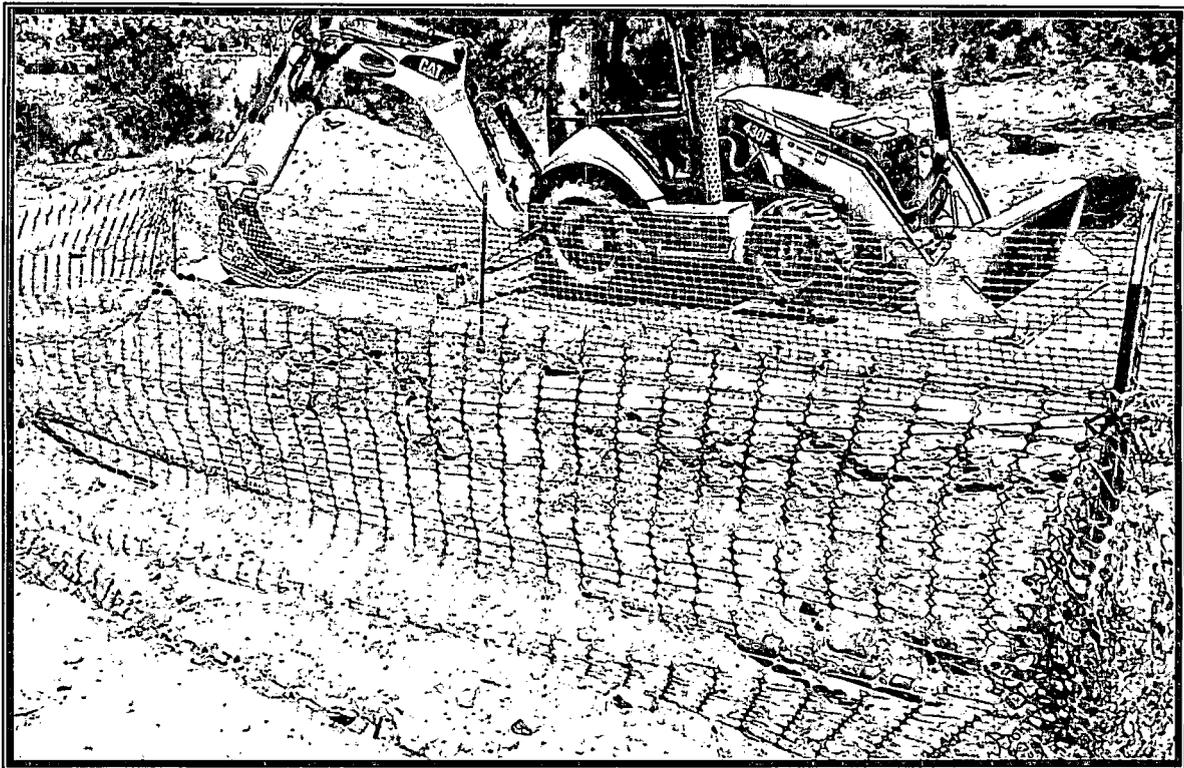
Final Excavation of the McKenzie #2 Well Tie Release site.
